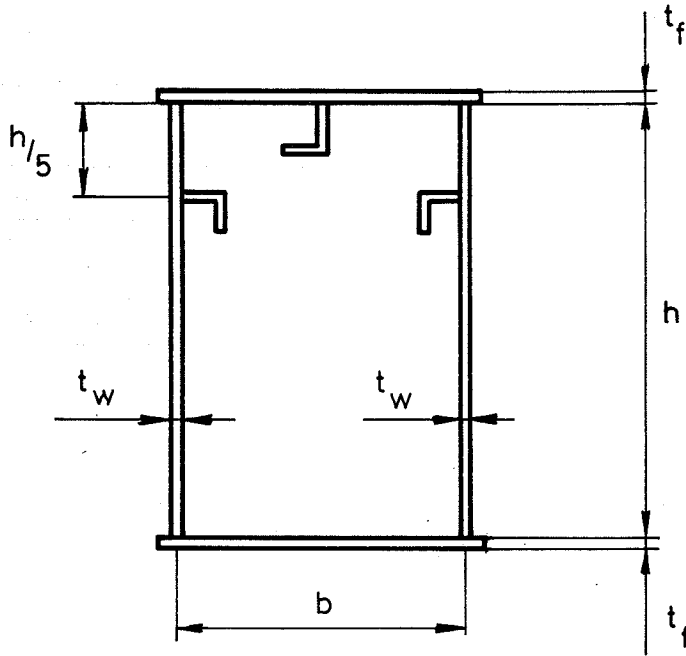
Cross section of the stiffened, welded box girders.
